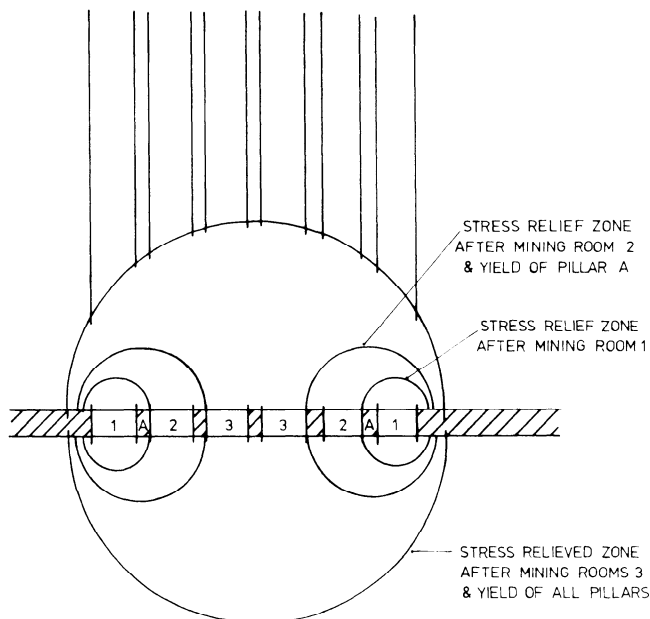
A yield pillar layout for a six entry system, illustrating the development of a stress-relieved zone.
